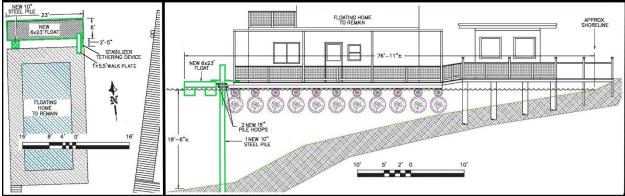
Overhead and profile drawings showing the applicant's proposed float, pile, and walk plate in green (Adapted from Sheets 3-5 of 7 in Waterfront 2021a).
